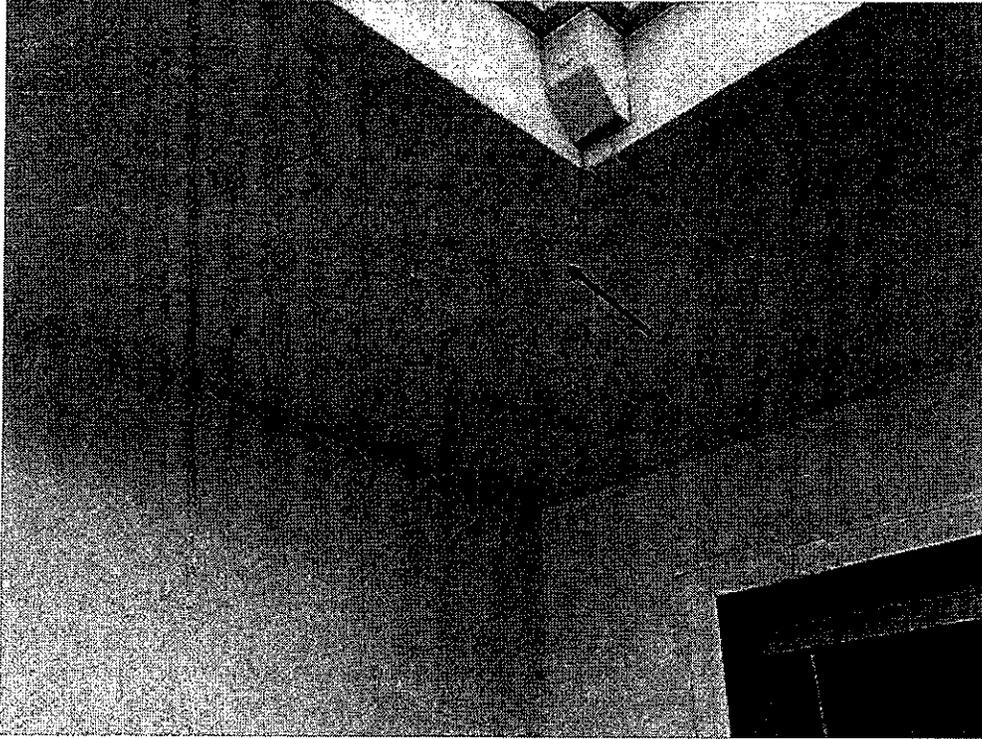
Cracking at the second level concrete floor slab of the employee apartment buildings
